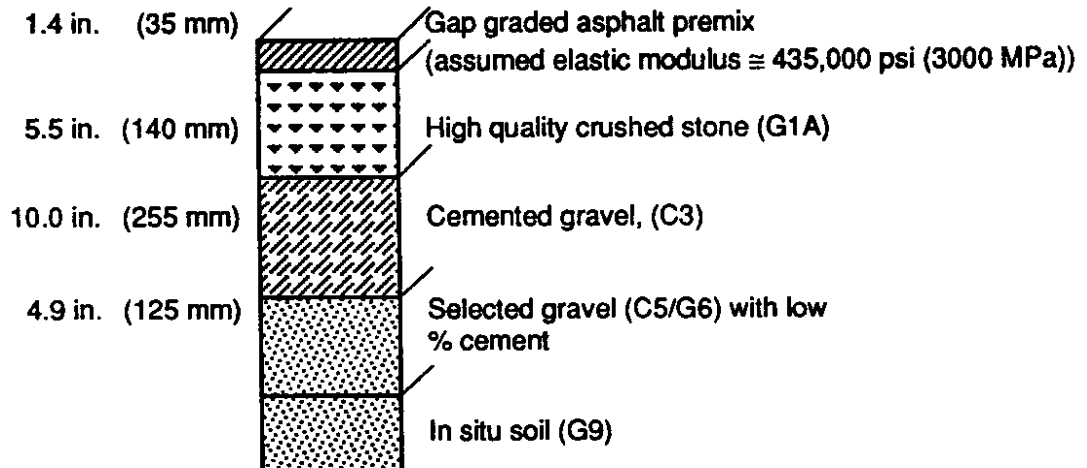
Inverted Pavements, Road P157/1 and P157/2, Tested with the Heavy Vehicle Simulator (4)
